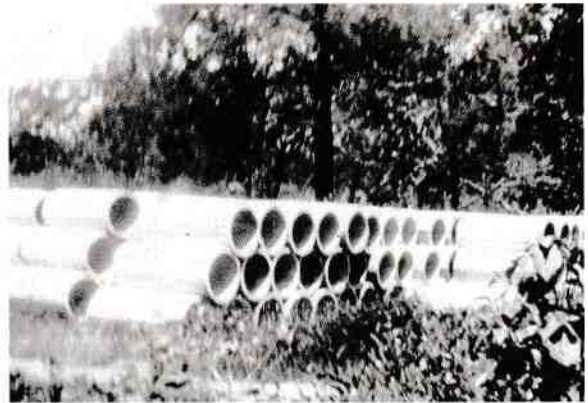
Pipes at the Ollera Creek pipeworks stacked ready to go to the construction site, Mt Spec Road in 1932.
